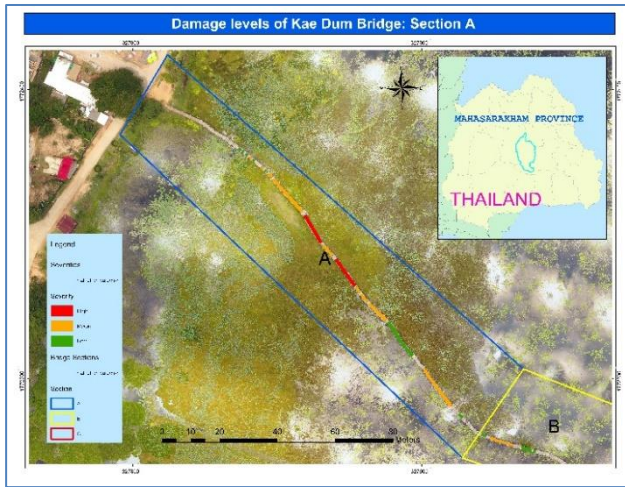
Damaged levels of Kae Dum wooden bridge: Section A
